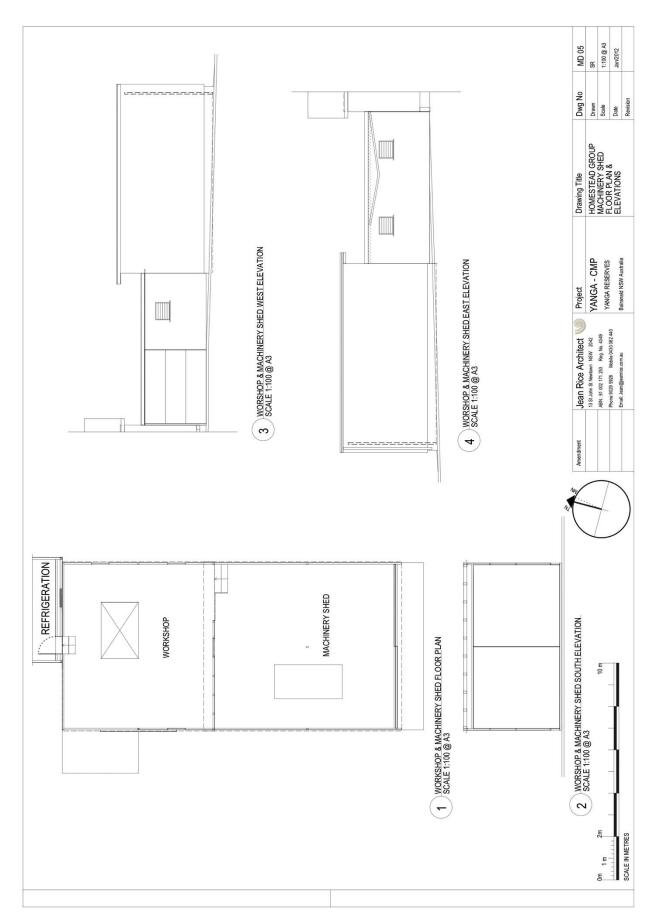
Homestead Group Workshop and Machinery Shed floor plan and elevations. Jean Rice Architect, site assessment 2009.
